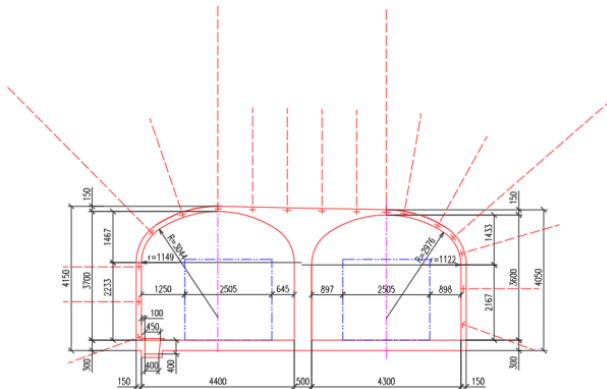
Support scheme for intersection part of drawbell drive and extraction drive.
